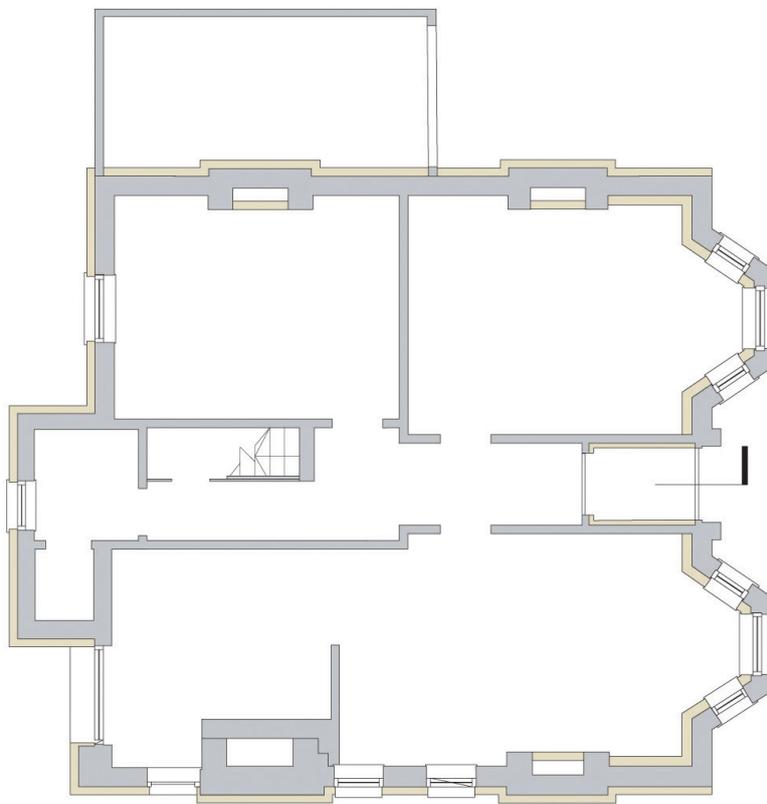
Ground floor plan - Marion Baeli and Paul Davis + Partners^{6,3}
